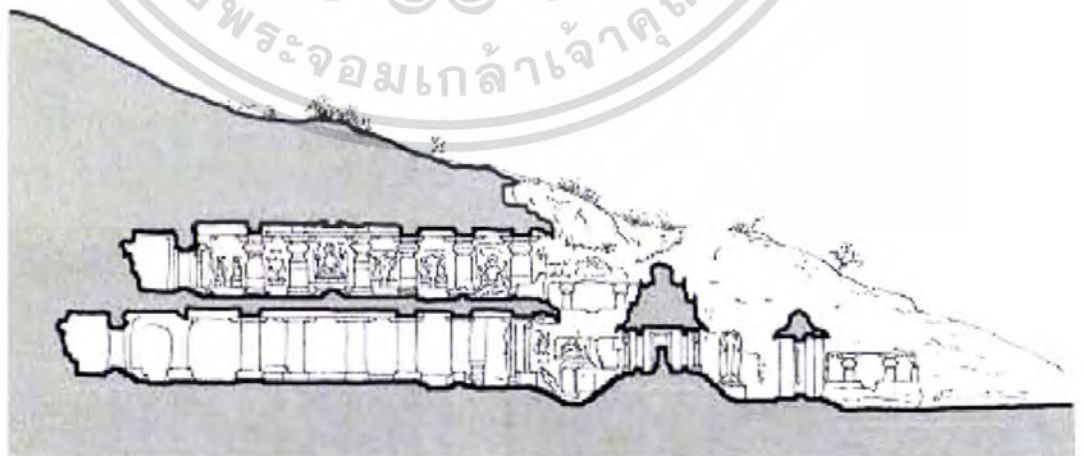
Pillars of the upper floor of Cave 32
